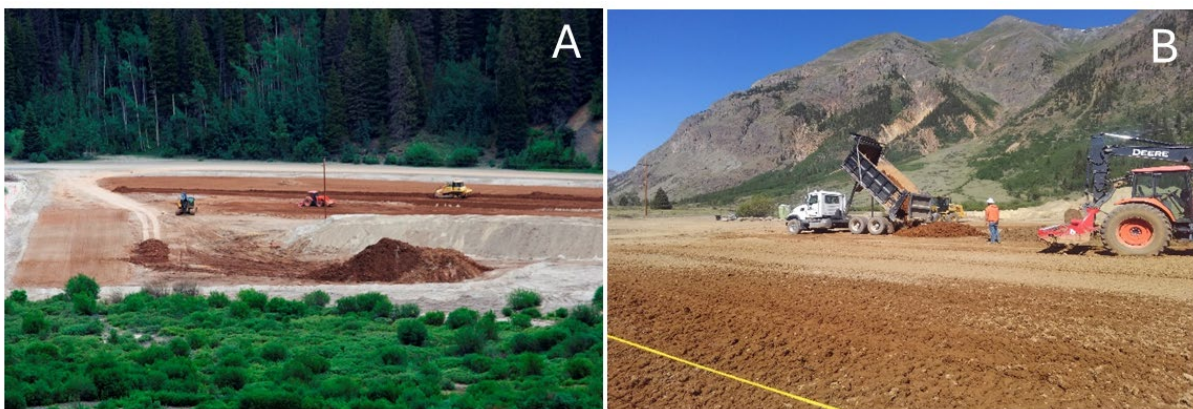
Kittimac tailings sludge and tailings stockpile (A) and sludge transportation during reclamation (B).
